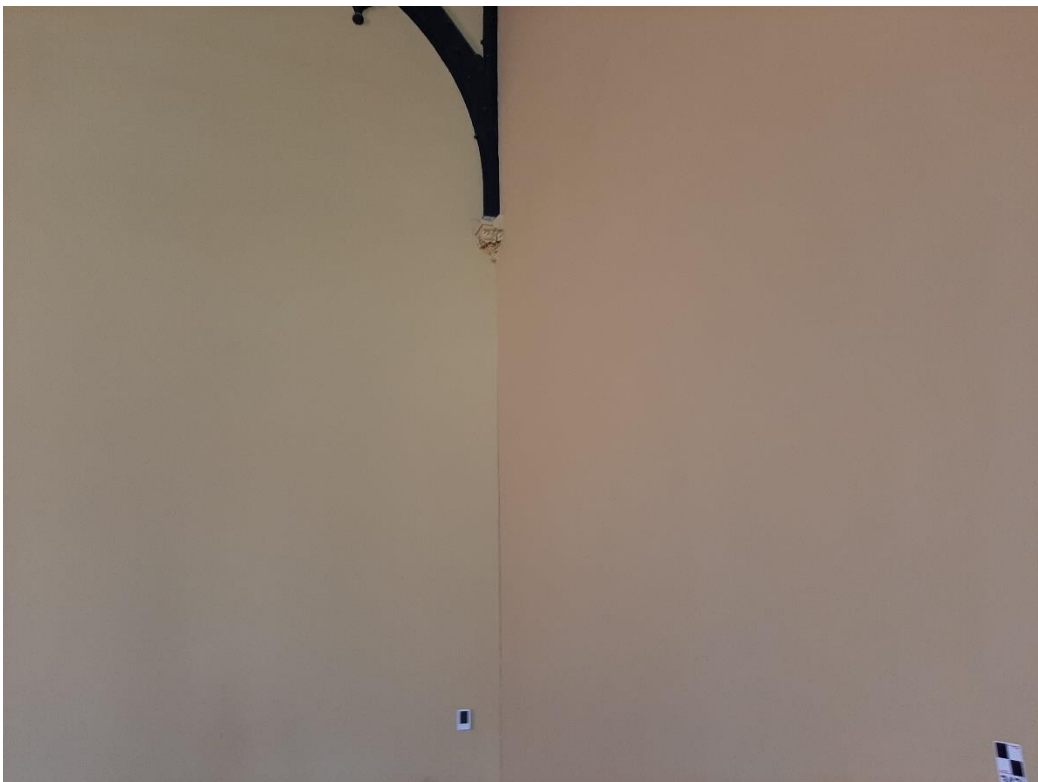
Top of South stairs to mezzanine - 5/3/21 inspection
